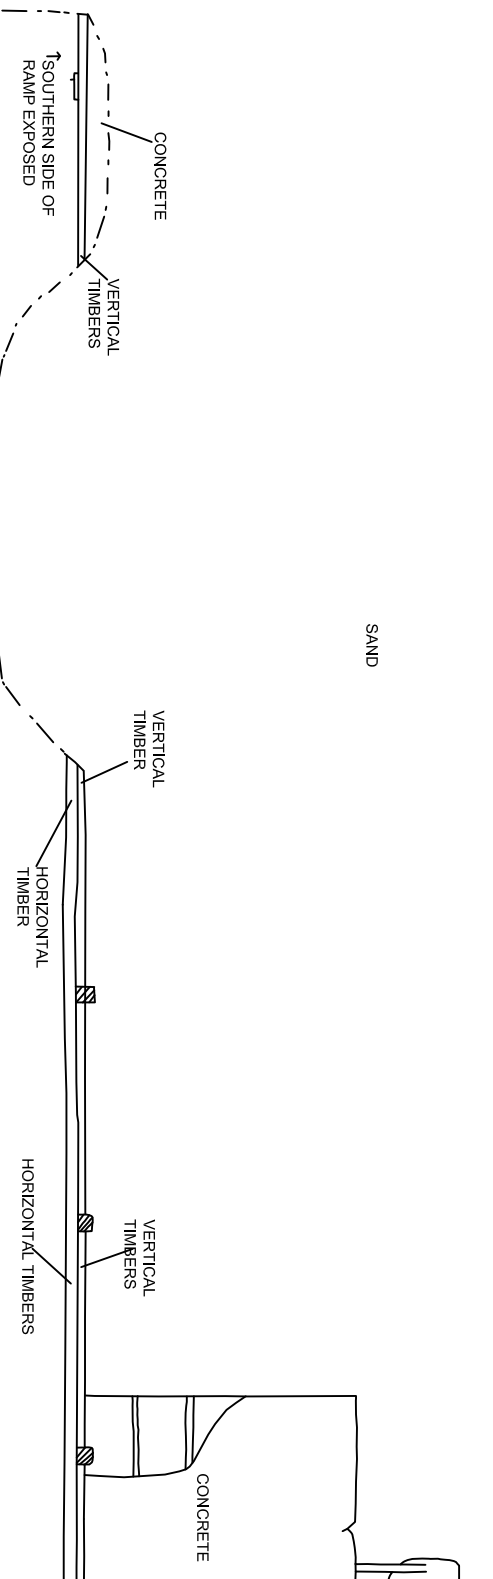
Northern view of seaplane ramp, highlighting vertical wooden beams overlain with horizontal beams. Scale = 1m.
